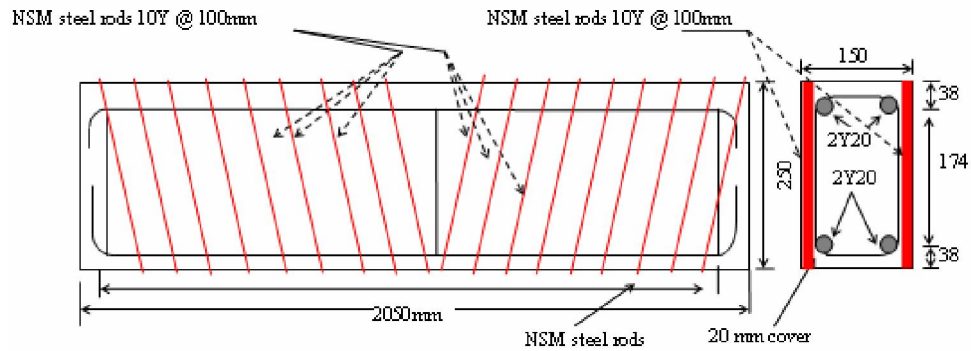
Arrangement of NSM steel rods in beam (NS)
